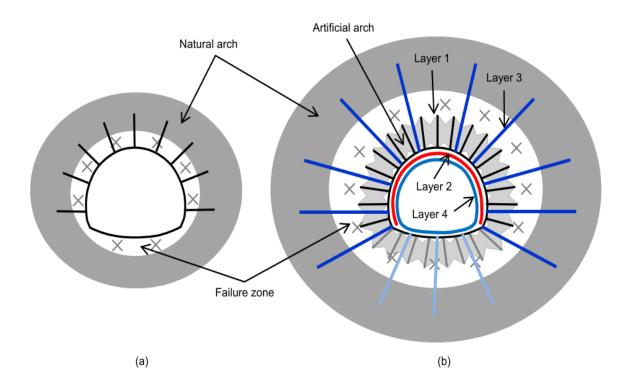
Layered structure of support systems, left: for limited failure zone, right: for large failure zone (Li, 2017)
